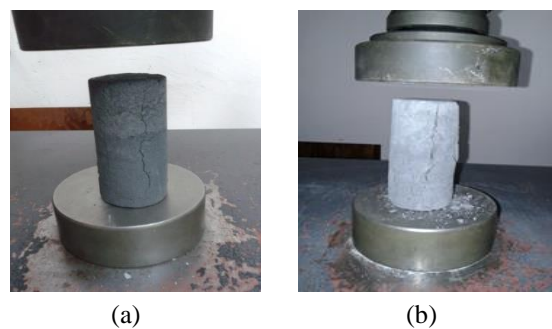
(a) Cylinder mold of 100 mm height. (b) Cylinder mold of 50 mm diameter.
